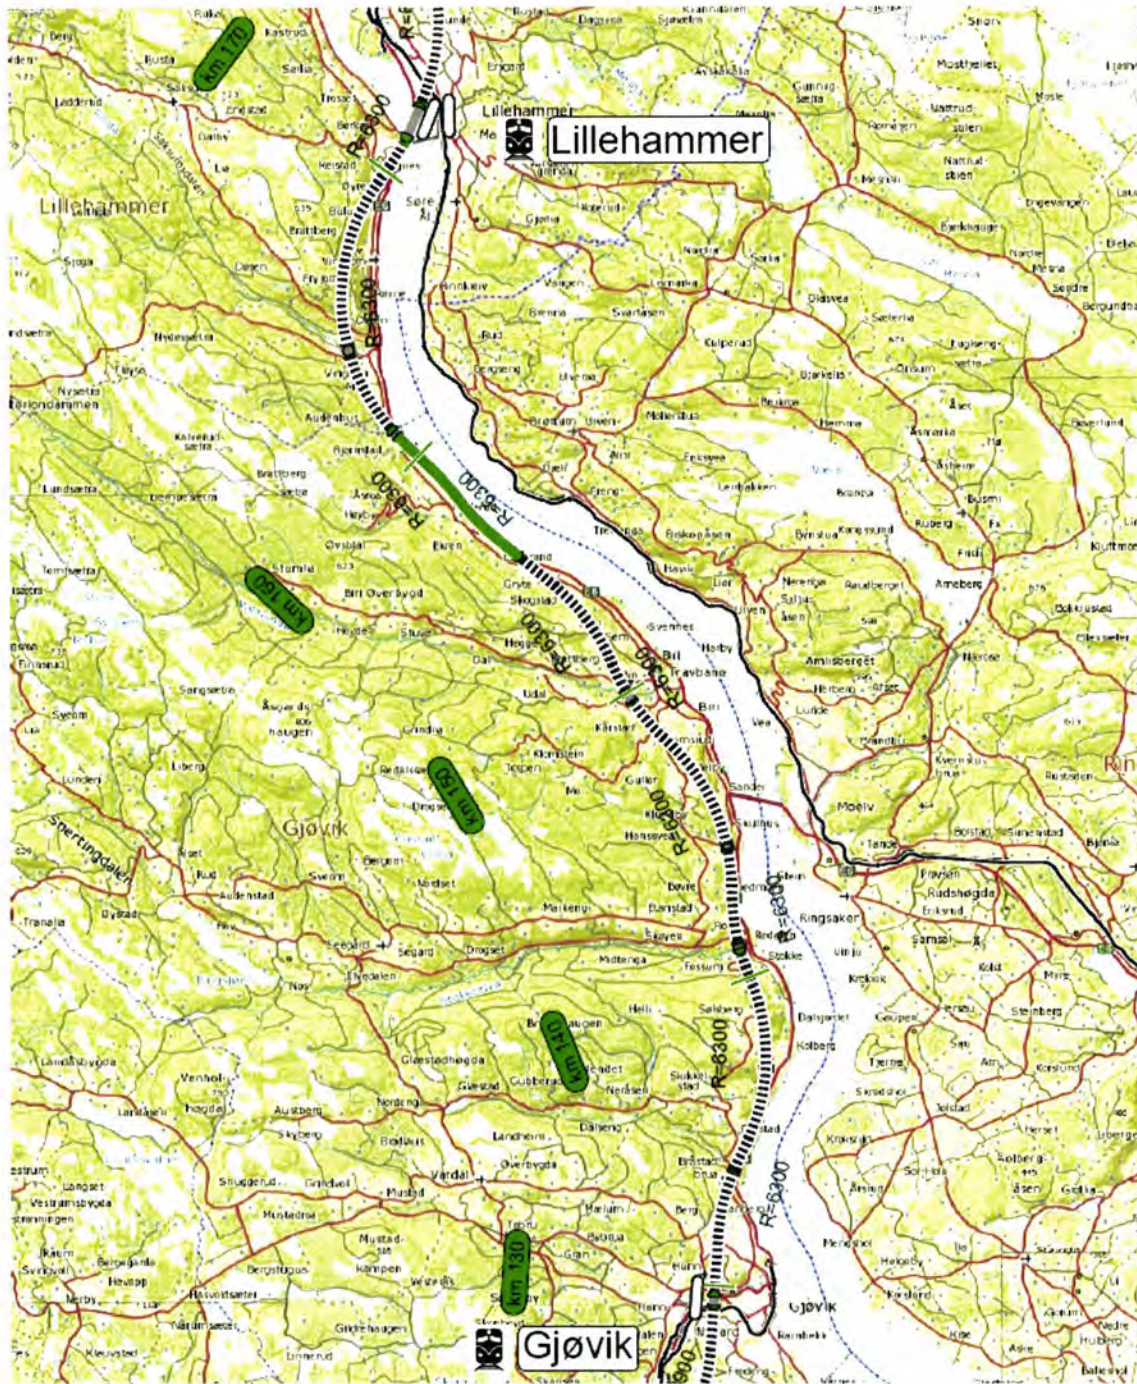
Proposed alignment GJ-D2 between Gjøvik and Lillehammer. Source: Geovekst.
